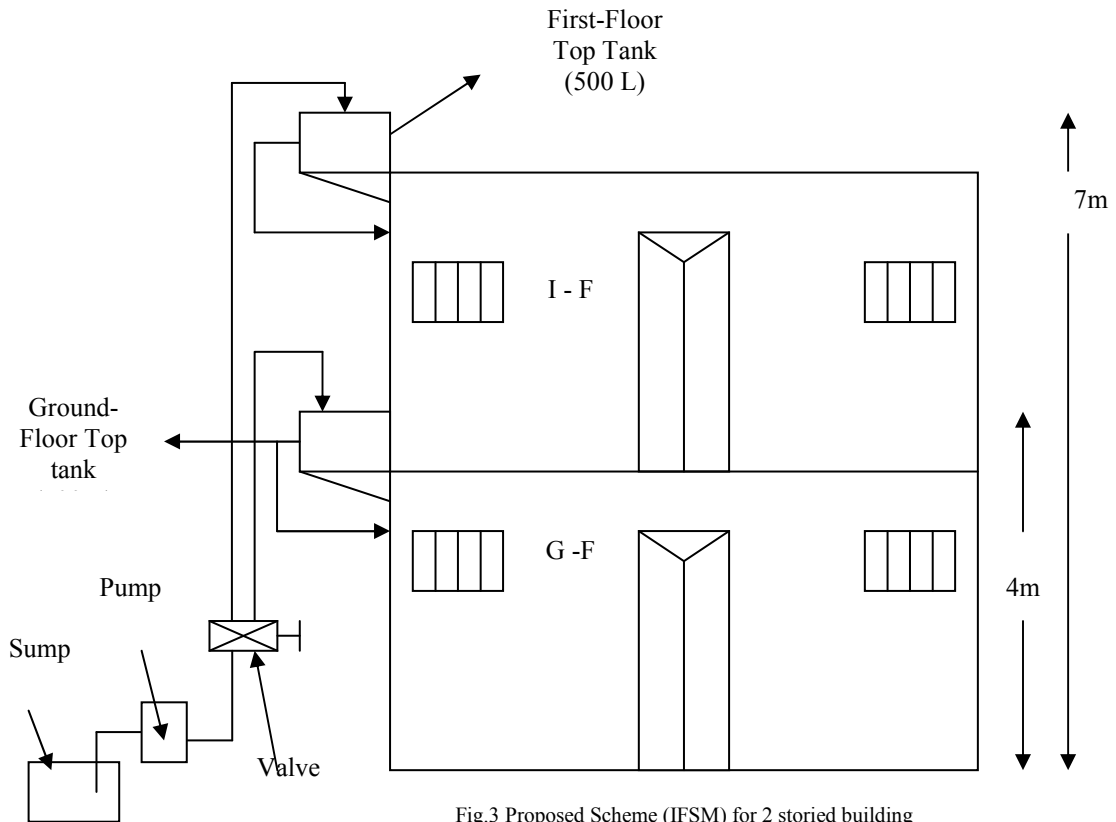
Proposed Scheme (IFSM) for 2 storied building
